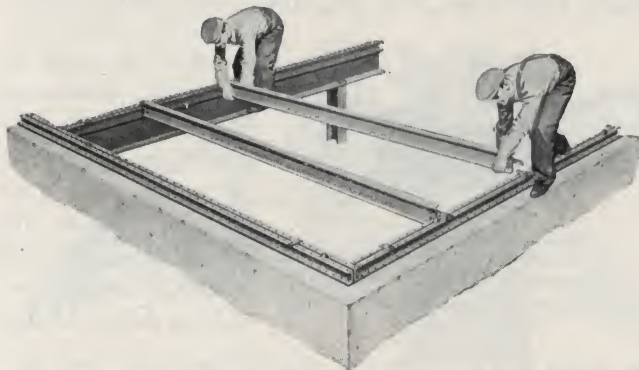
Floor Joists Laid Across Spans at Proper Intervals and to this the floor joist hanger is bolted as shown in Fig. 20.
